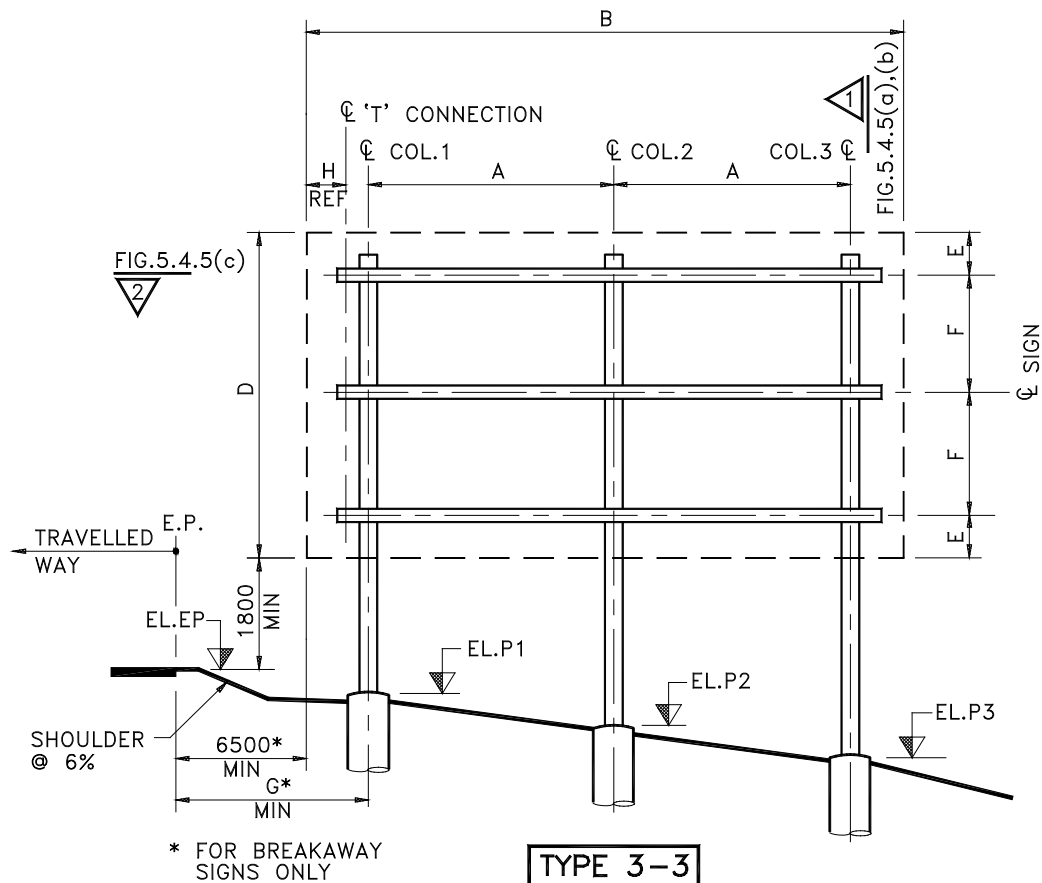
(c) ASSEMBLY AND INSTALLATION DIMENSIONS
